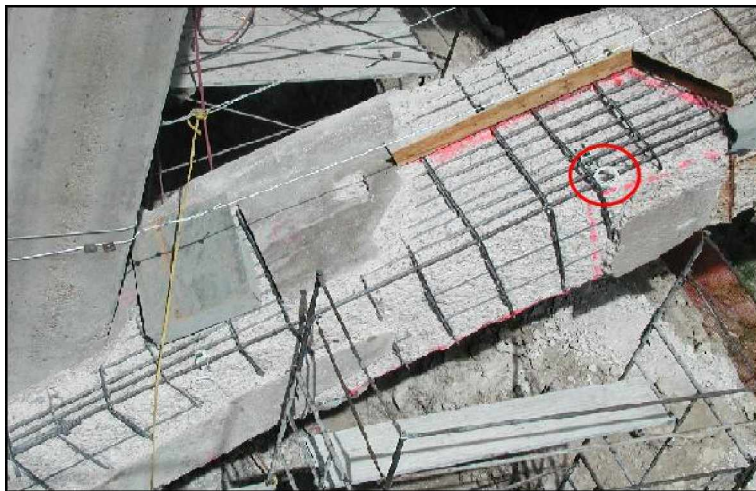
Locations of ECI-1 corrosion sensors installed in Castlewood Canyon Bridge
